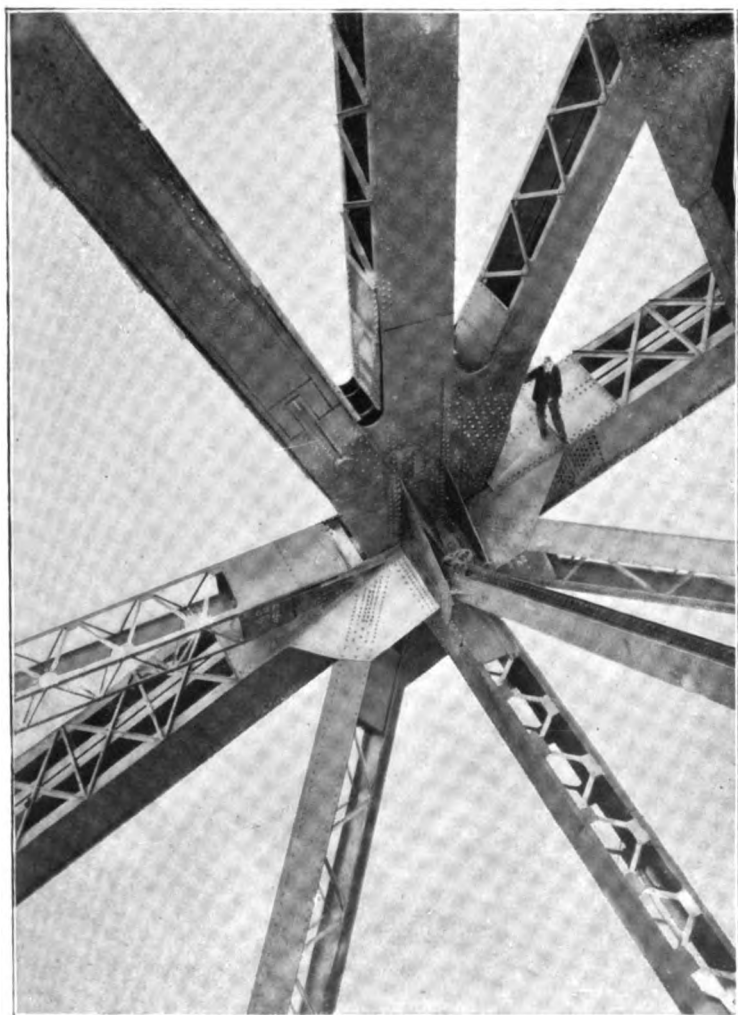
CONNECTION AT BOTTOM CHORD AT SECOND POINT FROM MAIN PIER ON WESTERN TRUSS OF SOUTH CANTILEVER.
